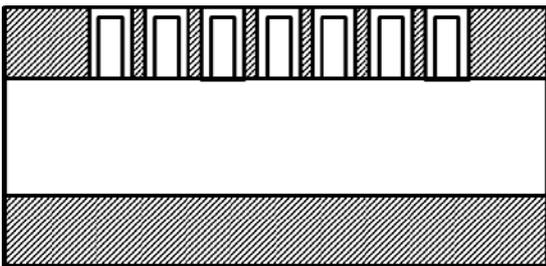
District heating pipe with uncovered cylindrical test specimens still attached to the service pipe.
